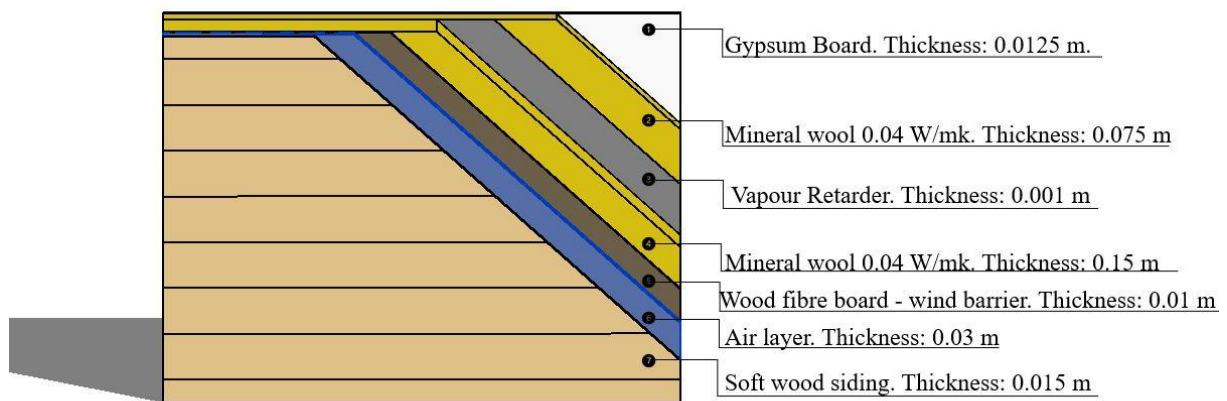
South exterior wall. Byggforsk 523,255 Exterior walls of half-timbering. Thermal insulation and sealing
